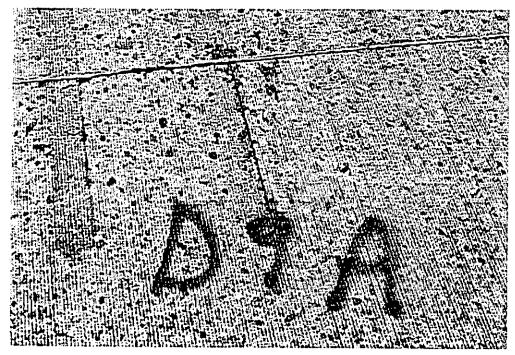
Longitudinal shrinkage cracks (Dunn, 1998).
